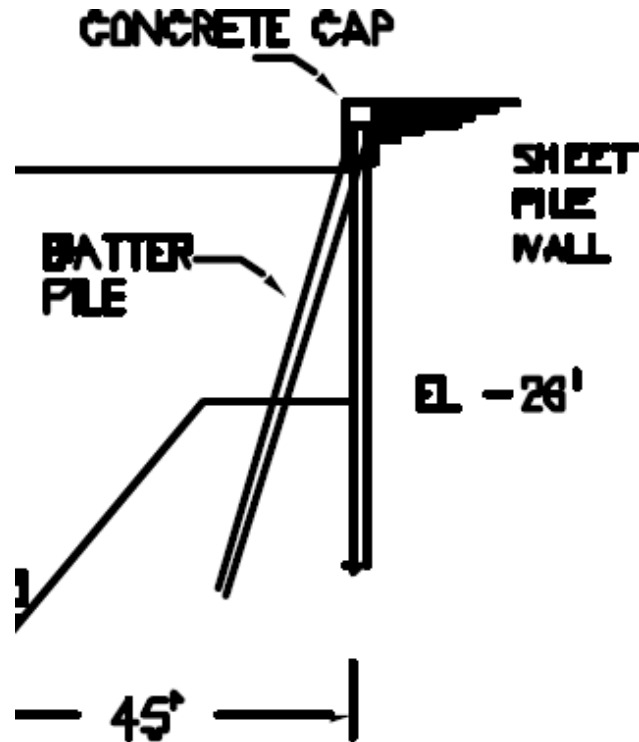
Cross Section of Bulkhead Used for the -50-ft Deepening Project at the Inner Harbor Basin
